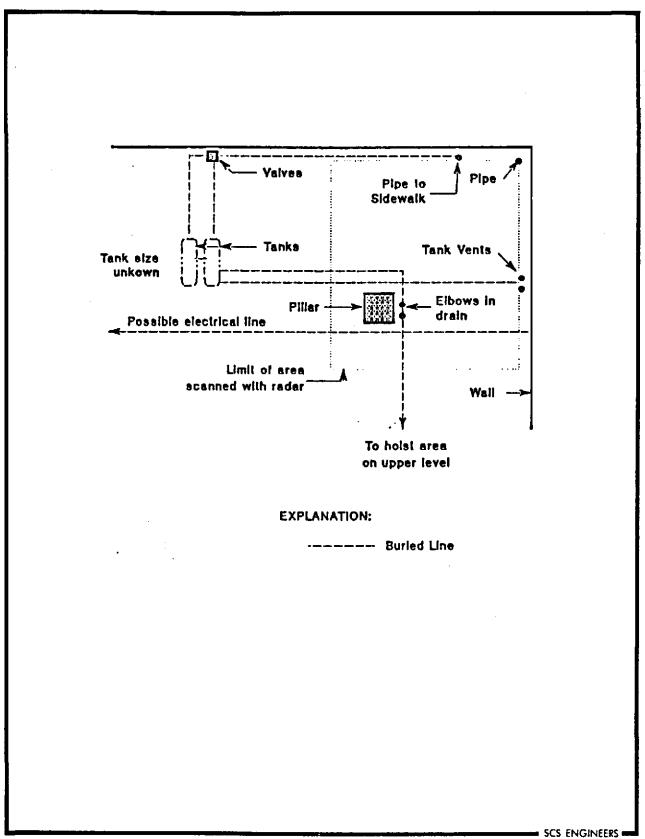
Detailed Site Plan of Alice Street Basement Garage, Showing Tank and Associated Piping Locations based on Geophysical Survey
